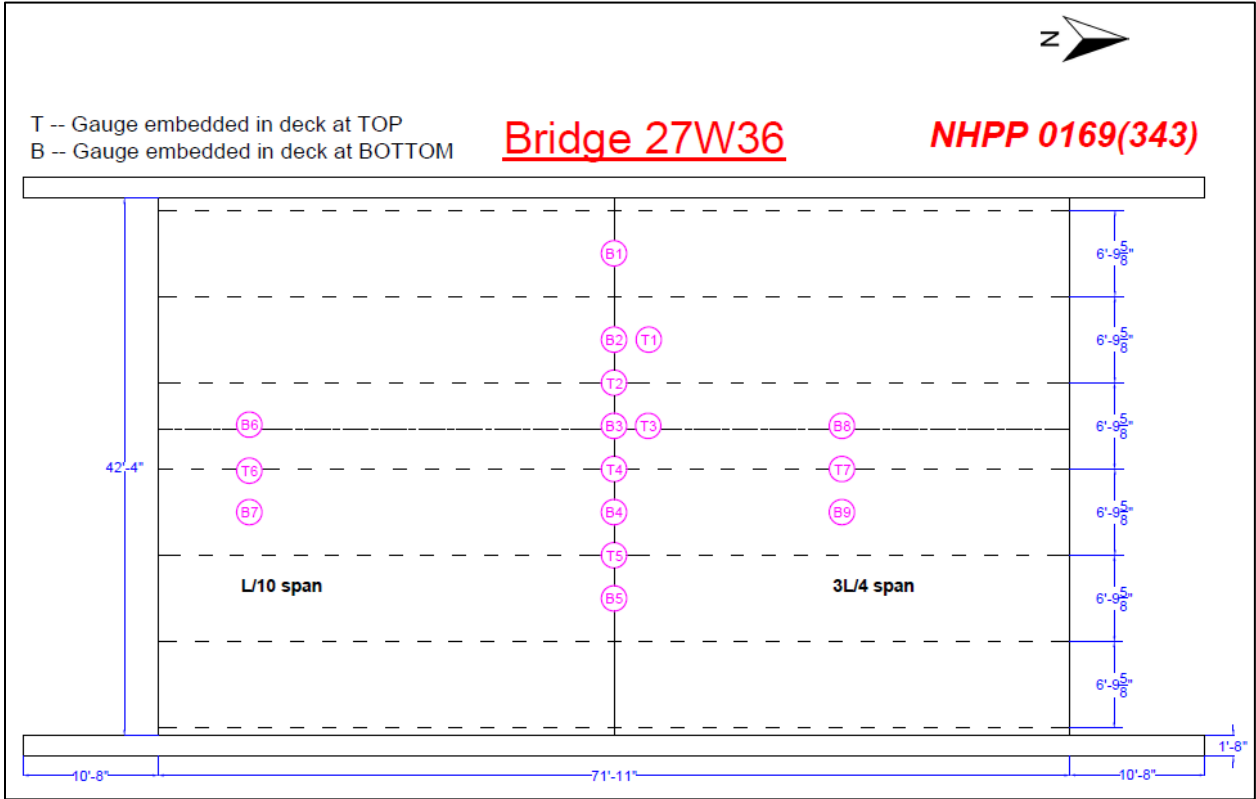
Instrumentation layout for long-term monitoring in steel-reinforced bridge deck (27W36)
